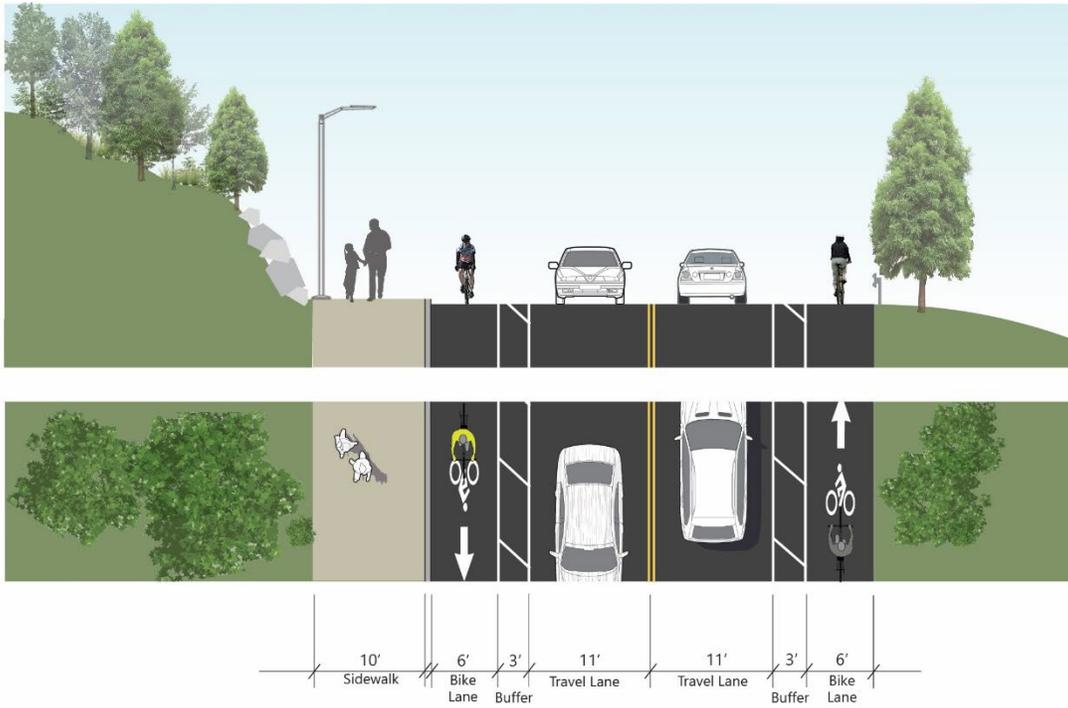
Section F-3: Long-term Concept for Fellsway West (north of Sheepfold), facing north (DRAFT CONCEPT)
